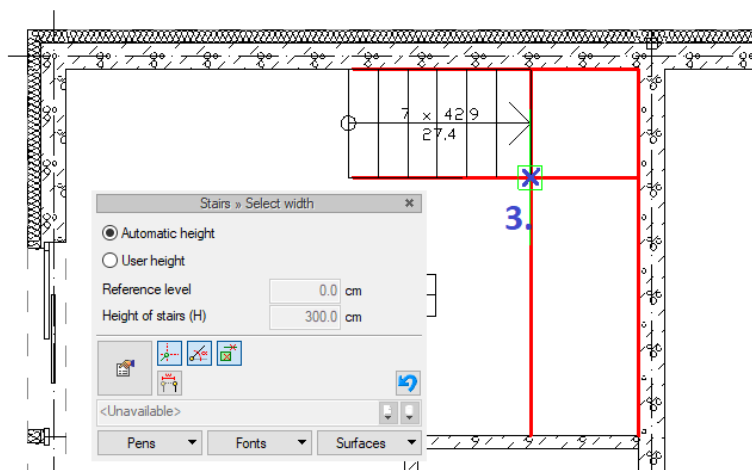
Inserting stairs – setting the width of the flight of stairs
